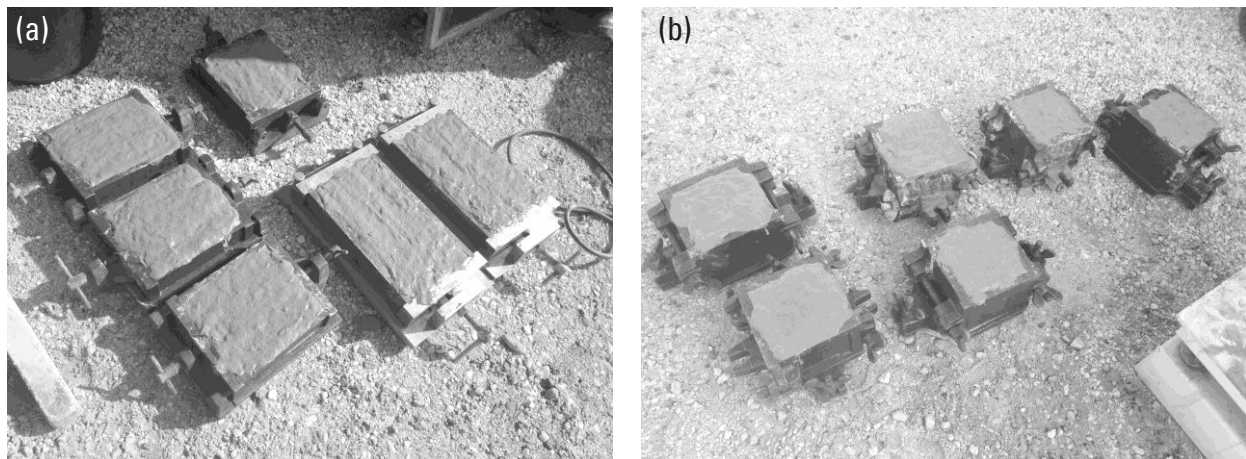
Moulds filled with SHCC after casting of the (a) dumbbell and prism specimen and (b) SHCC cubes
